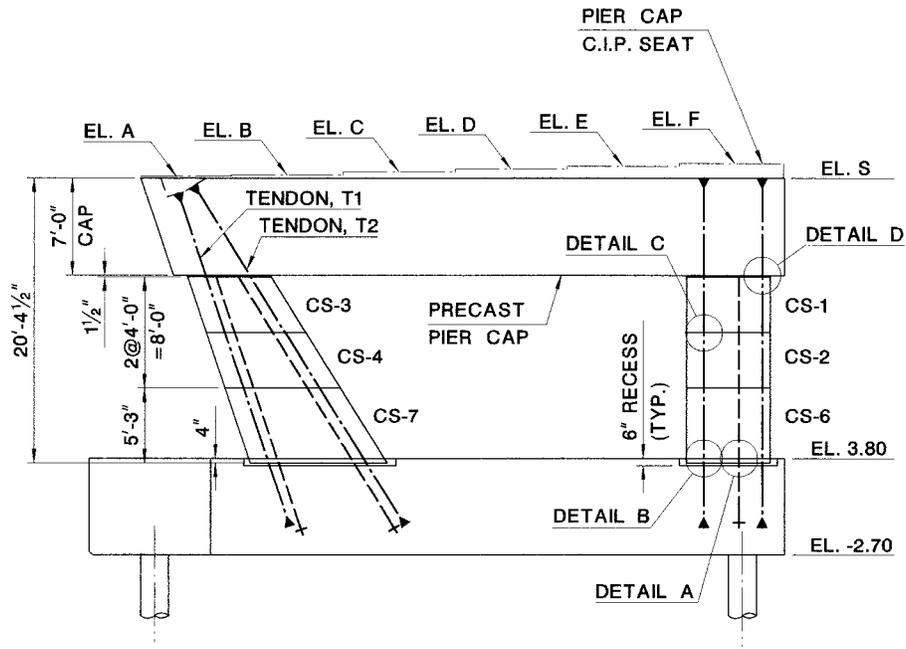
Pier Post - Tensioning Bars and Ducts Layout
